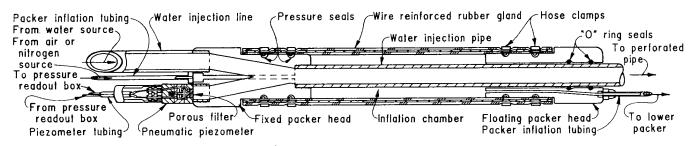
Schematic arrangement of drill hole packer and pressure monitoring equipment. 801-D-180
